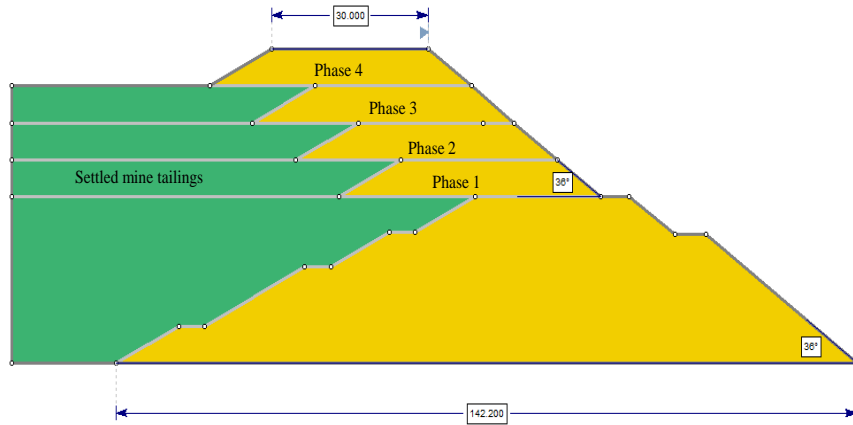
A typical cross-section of tailings dam at the end of construction using U/S method of construction.
